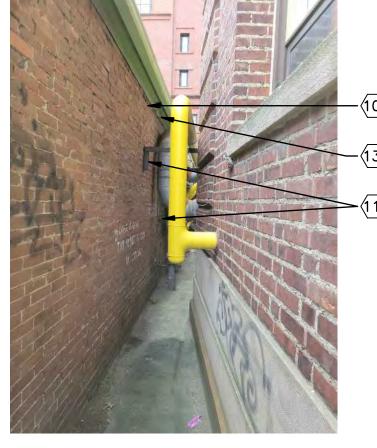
REAR SOUTH WALL CONNECTING RHODE ISLAND SCHOOL OF DESIGN
